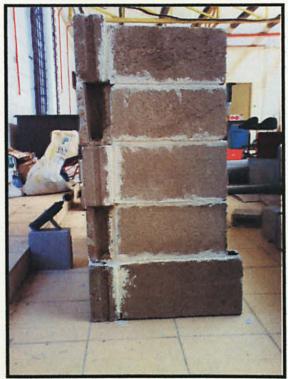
Actual side view of the sound reduction testing setup (with side wall)
